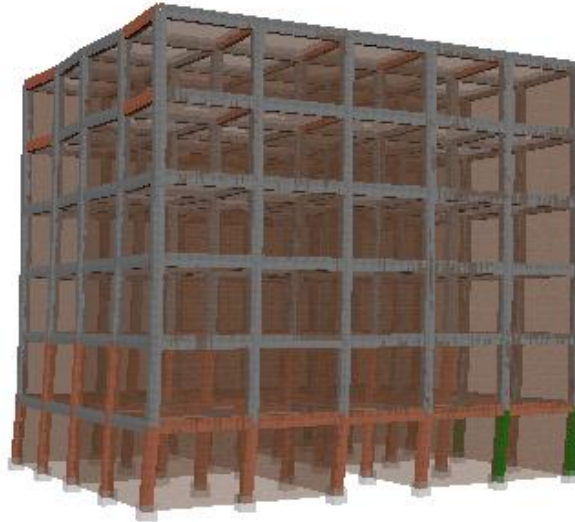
Damaged Level of Brick infill Walls of Case Study 1
